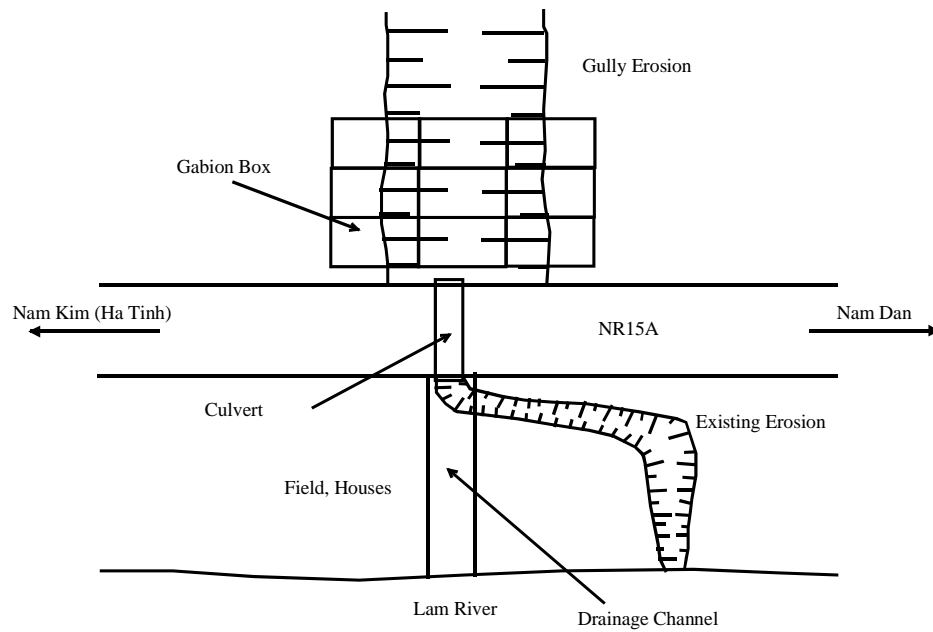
Plane of Gully Erosion Countermeasure
